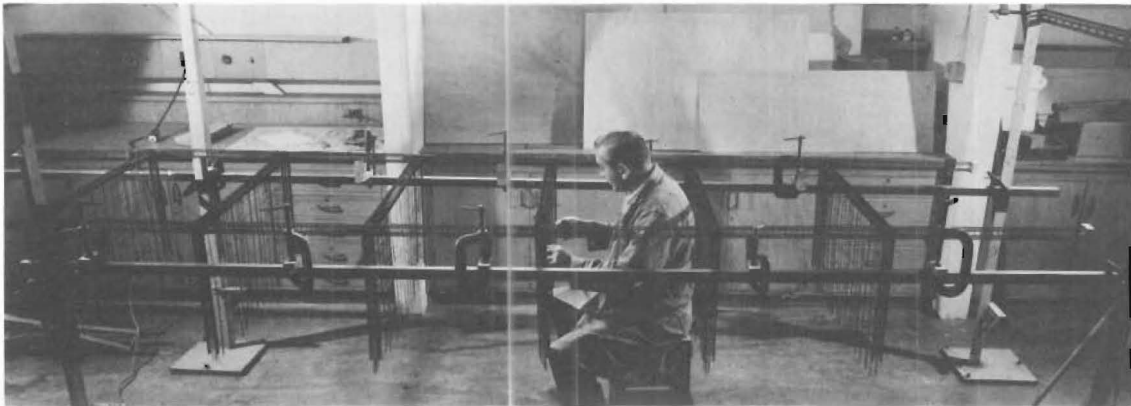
CONSTRUCTION OF A REINFORCING CAGE
